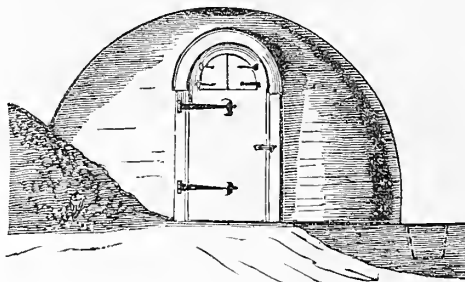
FRONT VIEW OF SPRING HOUSE.
